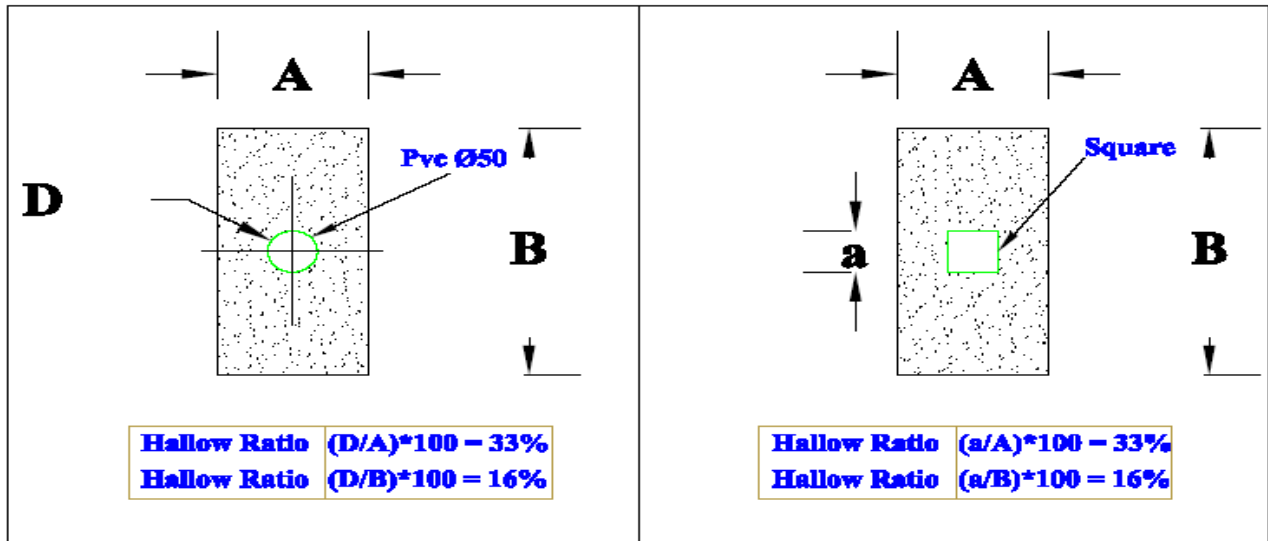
Details of Hallow Ratio & Location (at center of cross section).
